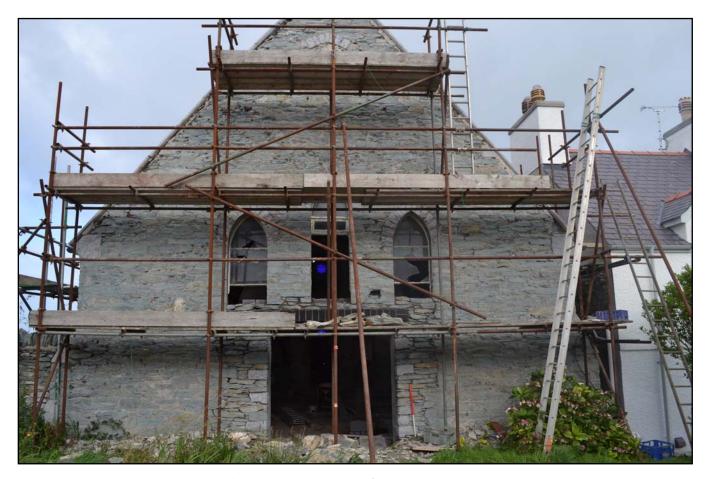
Capel Horeb external southeast elevation. Photograph taken from the southeast.
